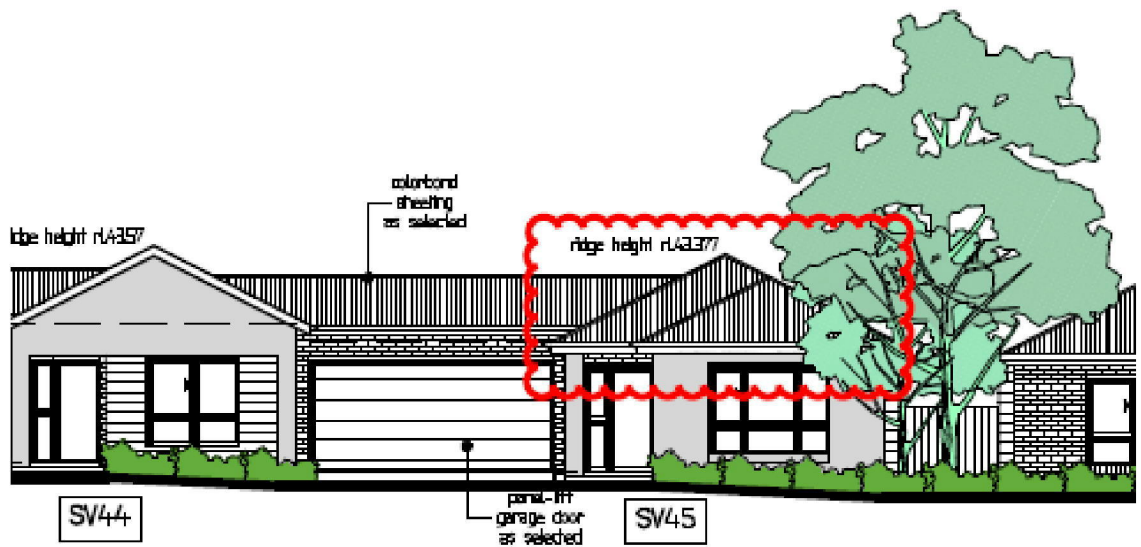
Extract of proposed Villa SV45 detailing proposed hip roof design
